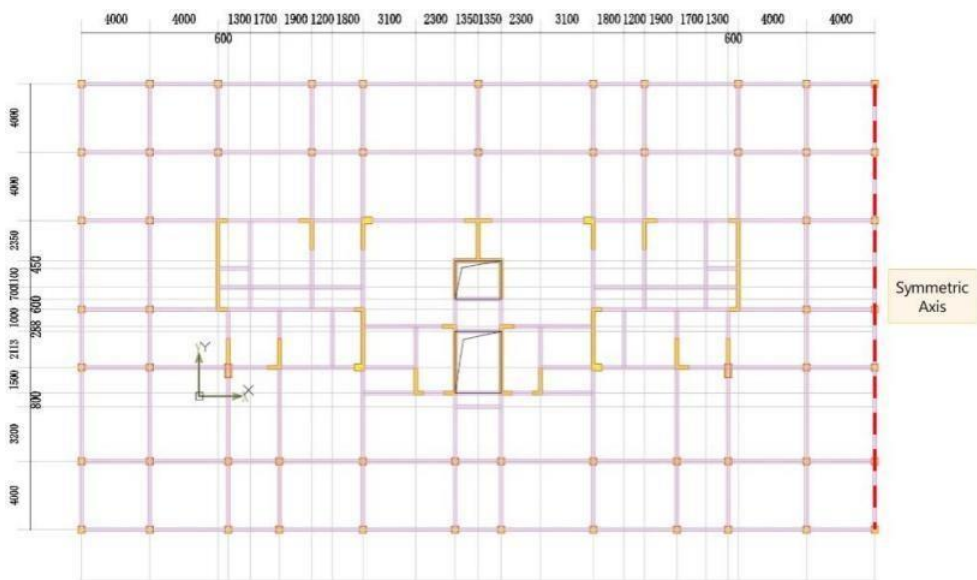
Half plan view of the enlarged basement for Model 1 (level 1 to 2) [26]
